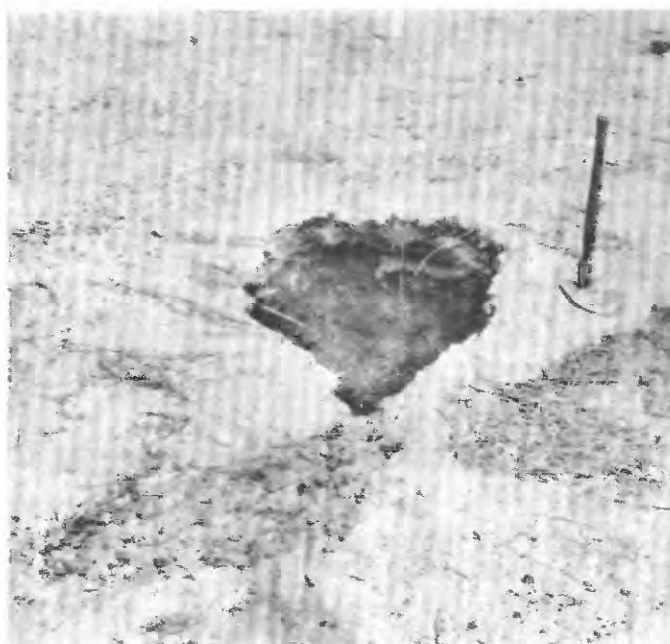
A natural vertical drainage hole in the floor of the borrow pit on slump block A 1. As observed on January 23, 1974, the hole appeared to be the drain for hundreds of square metres of pit floor. This would suggest a permeable zone or "pipe" that might result in piping of underlying sand and caving of the surface. The formation is the upper member (Shrewsbury) of the Red Bank Sand.
